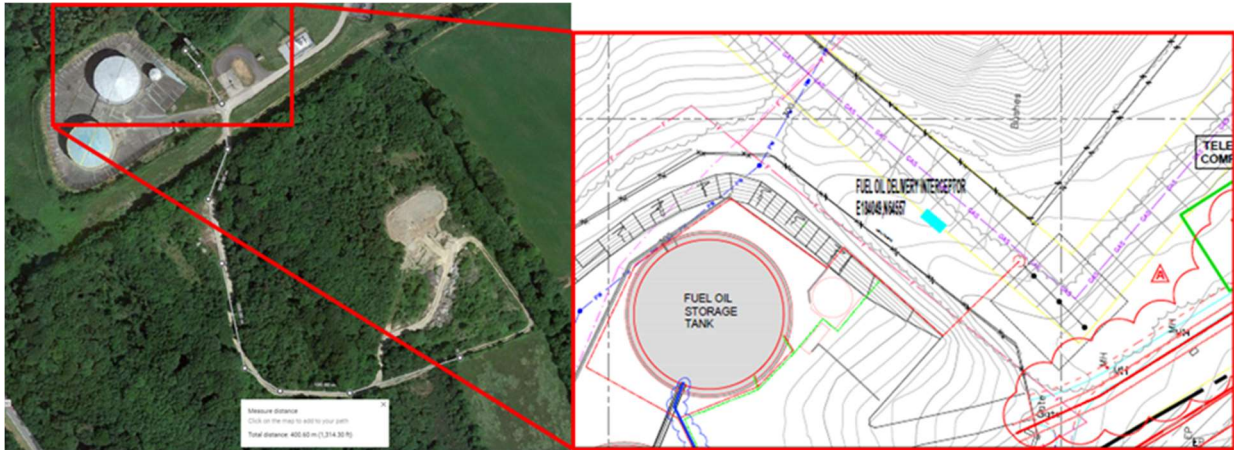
Connection from Data Centre to existing Aghada station drainage system
